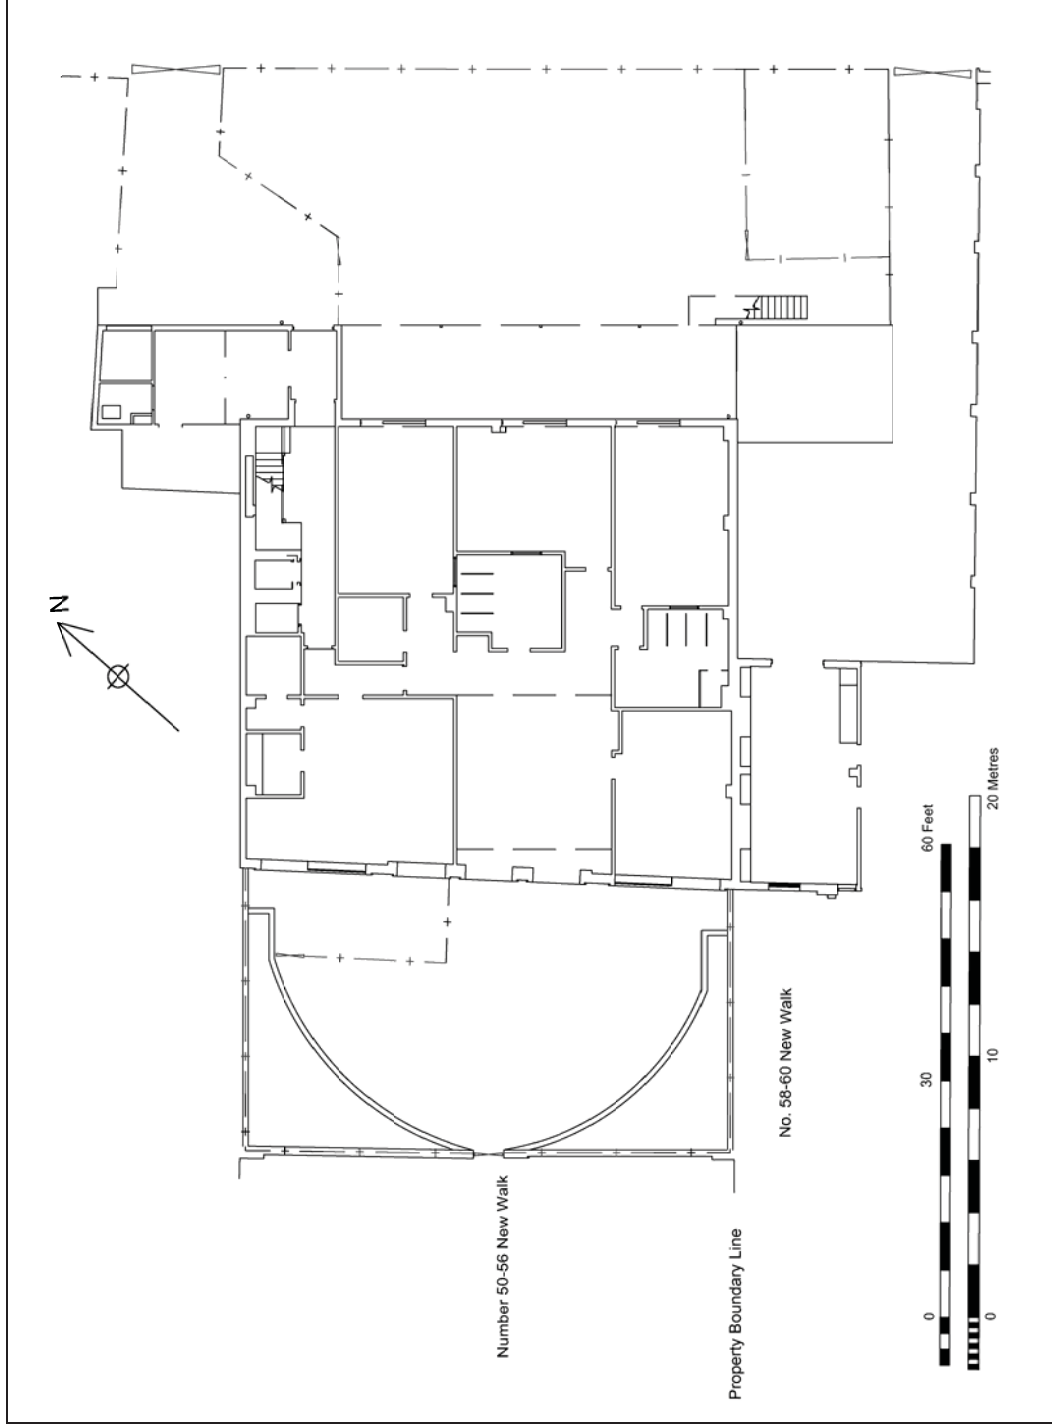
Existing ground floor plan of 50-56 New Walk (taken from survey drawings supplied by Greenhatch)
